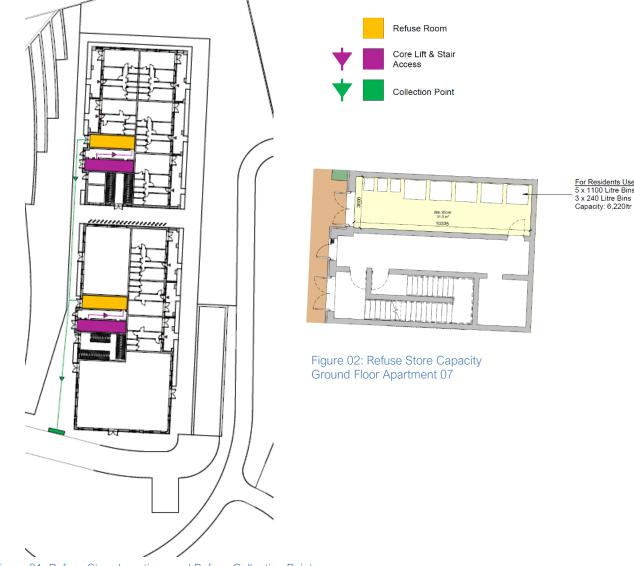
Refuse Store Locations and Refuse Collection Point Ground Floor Apartment 07
